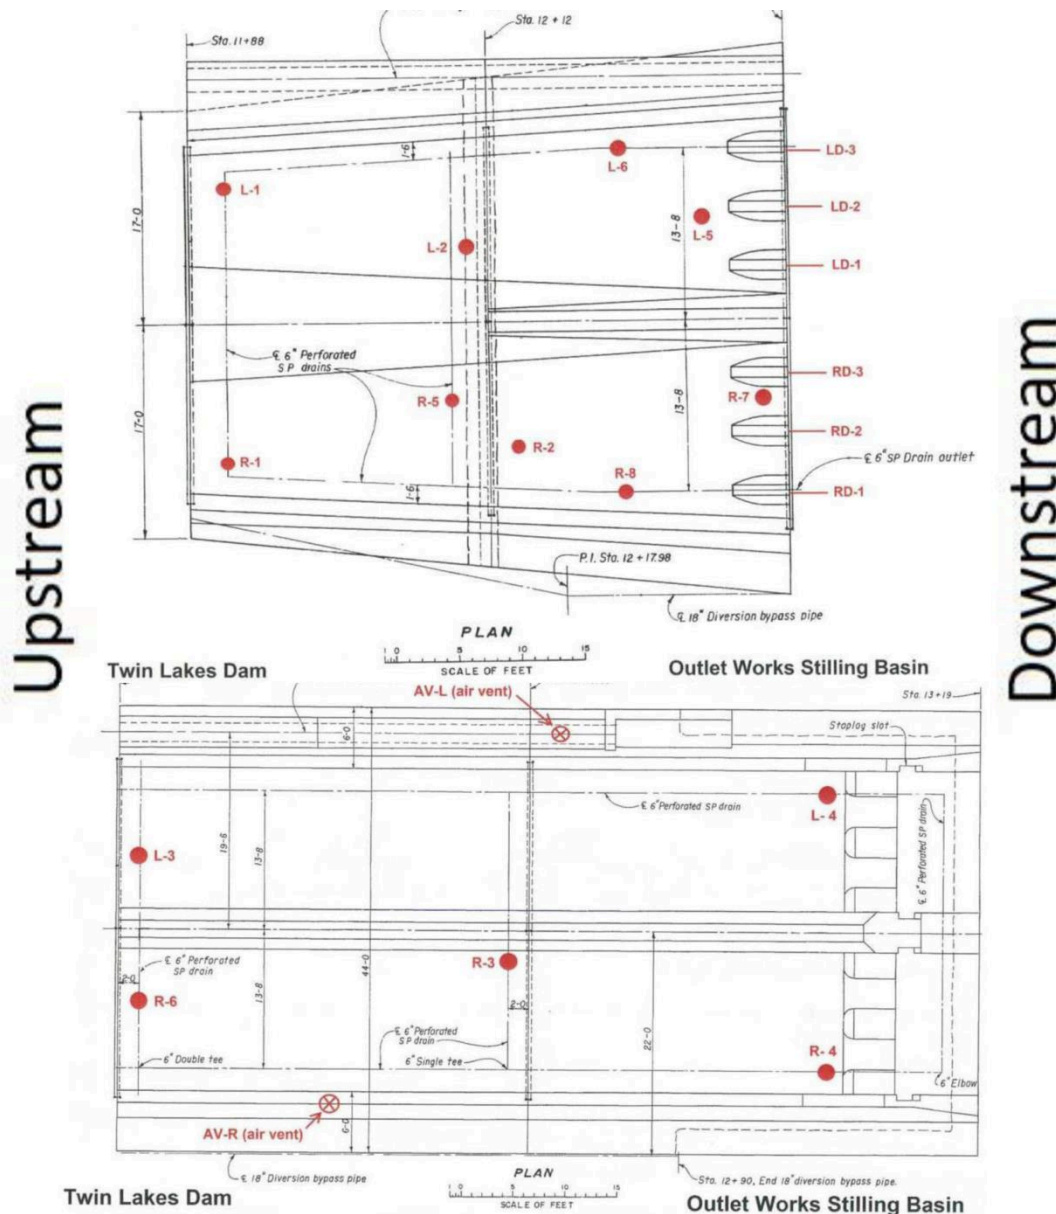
Boring Locations for Grouting Twin Lakes Dam Outlet Works.
